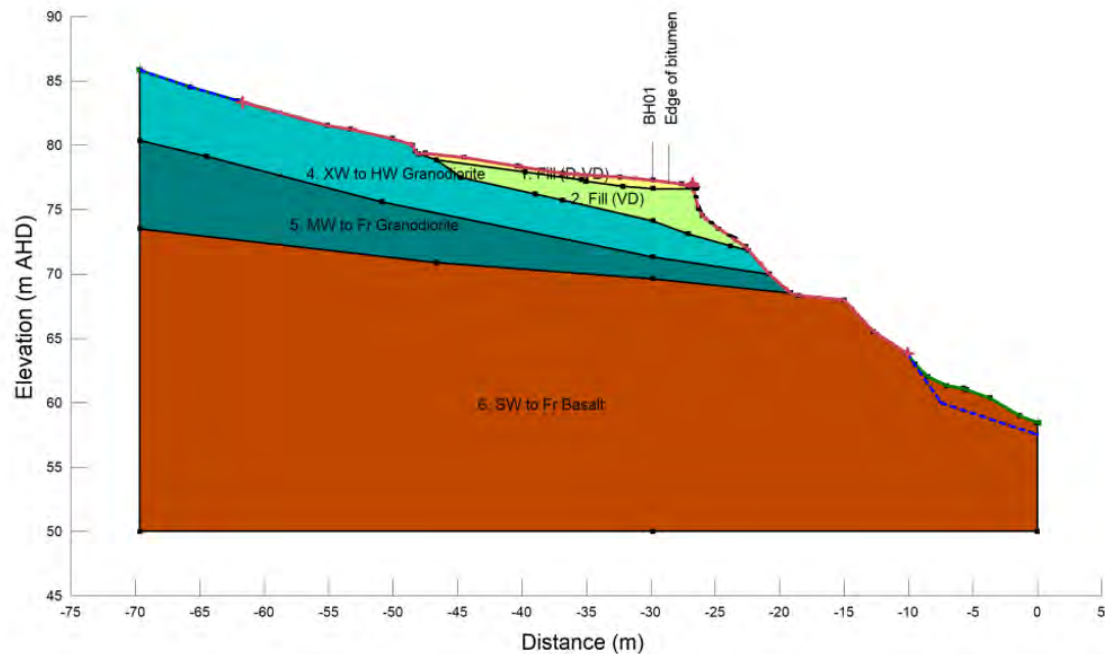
Section A-A cross section geotechnical model, based on subsurface conditions encountered in BH01
